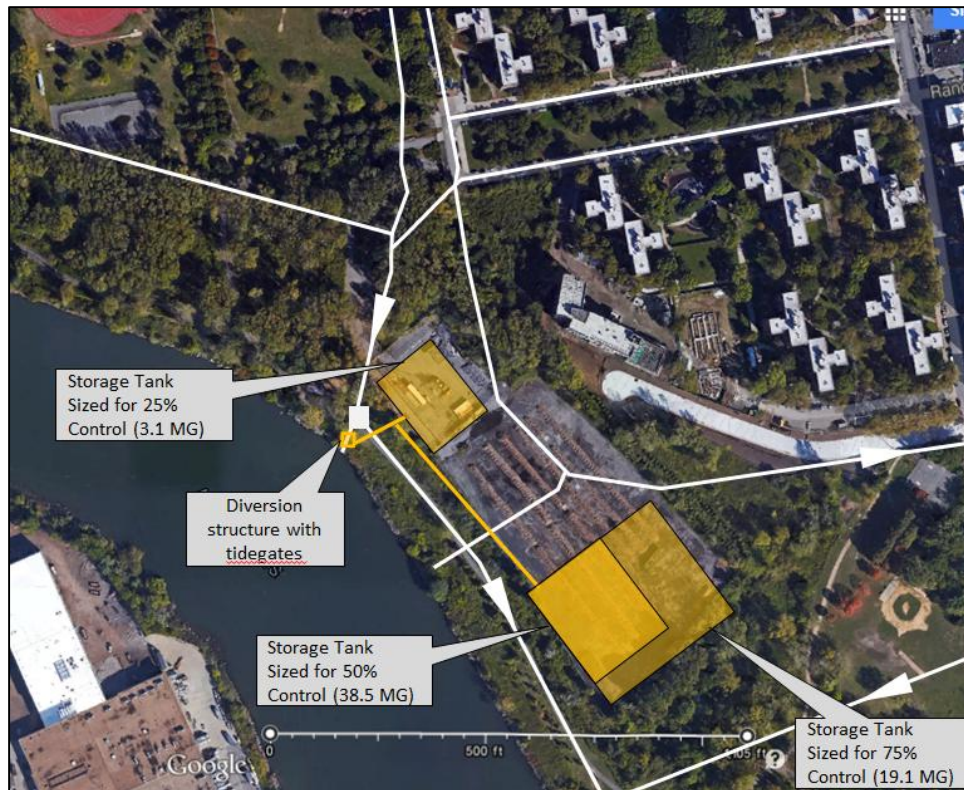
Layout of Alternative 9-8 – Outfall HP-009 Local Storage Tank
